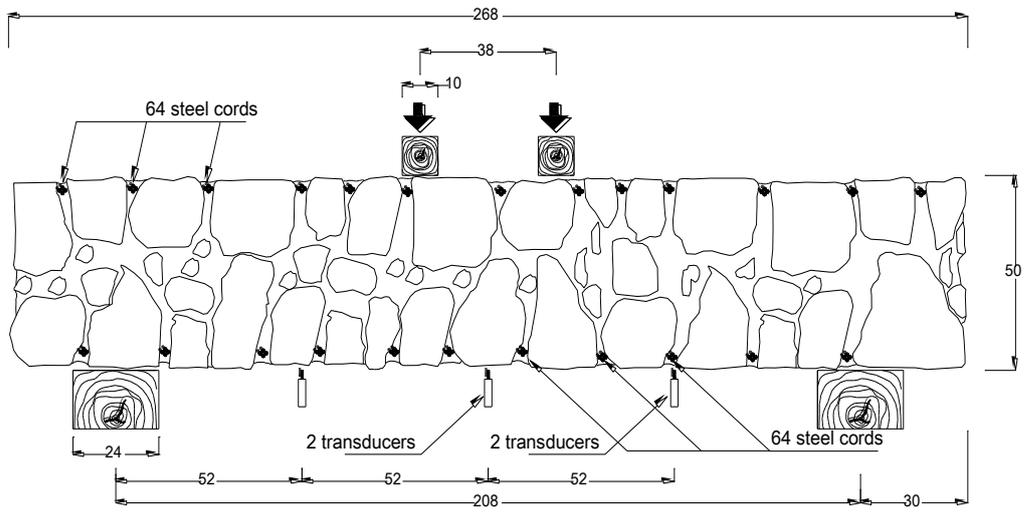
On-site bending tests: test arrangement (dimensions in (cm)).
